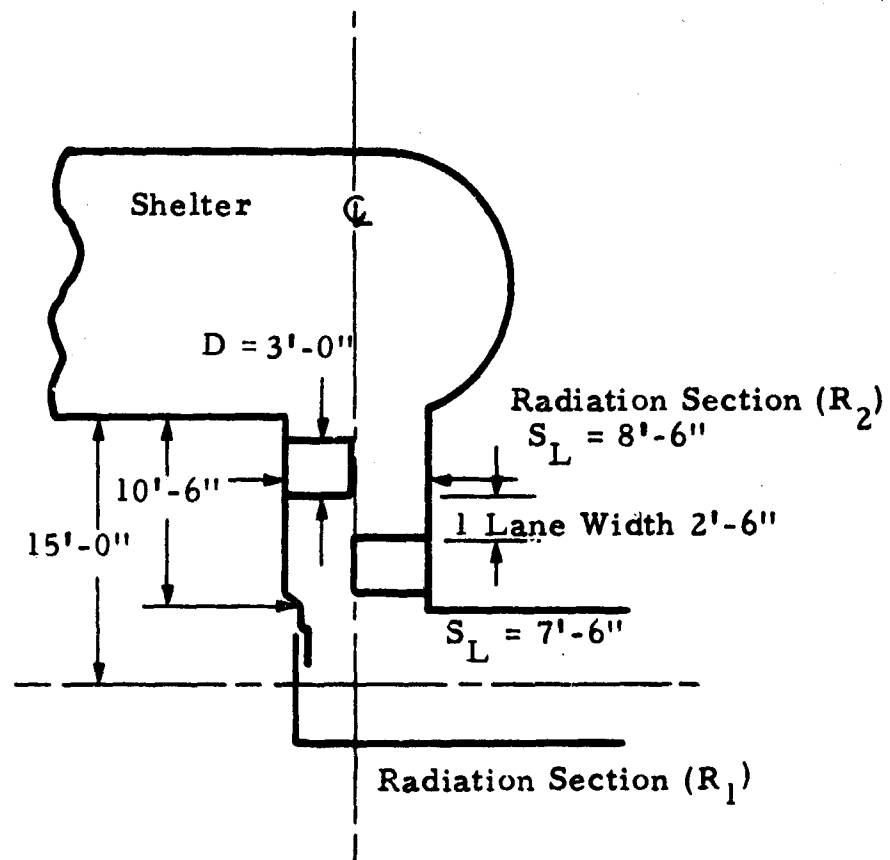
PLAN VIEW OF RADIATION BARRIER SHIELD
